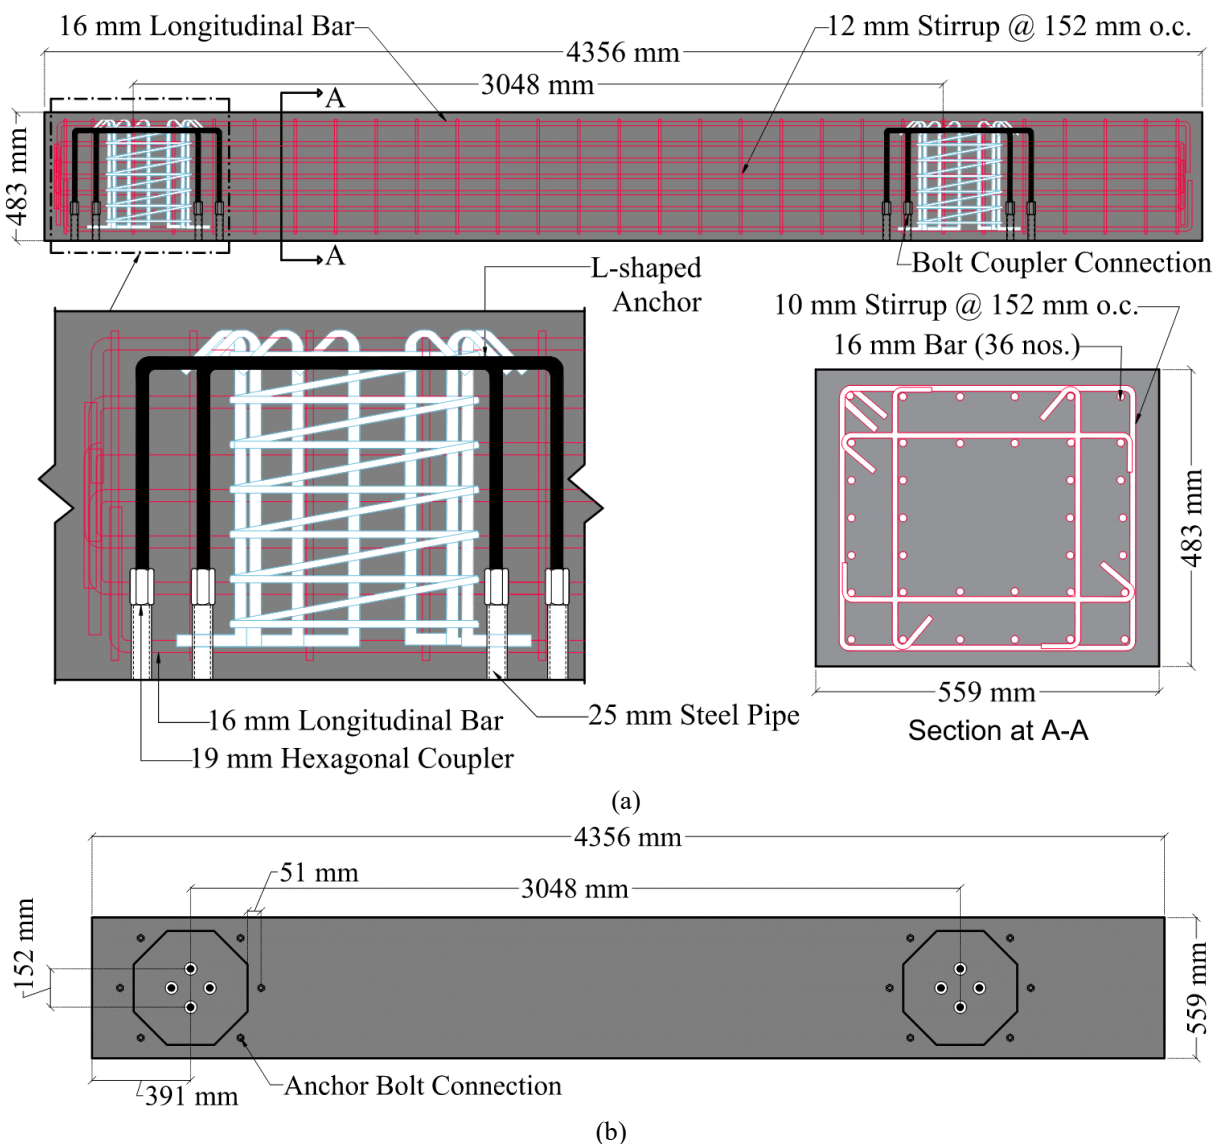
Cap beam details: (a) elevation and reinforcement; and (b) anchor bolt connection details and bottom view.
